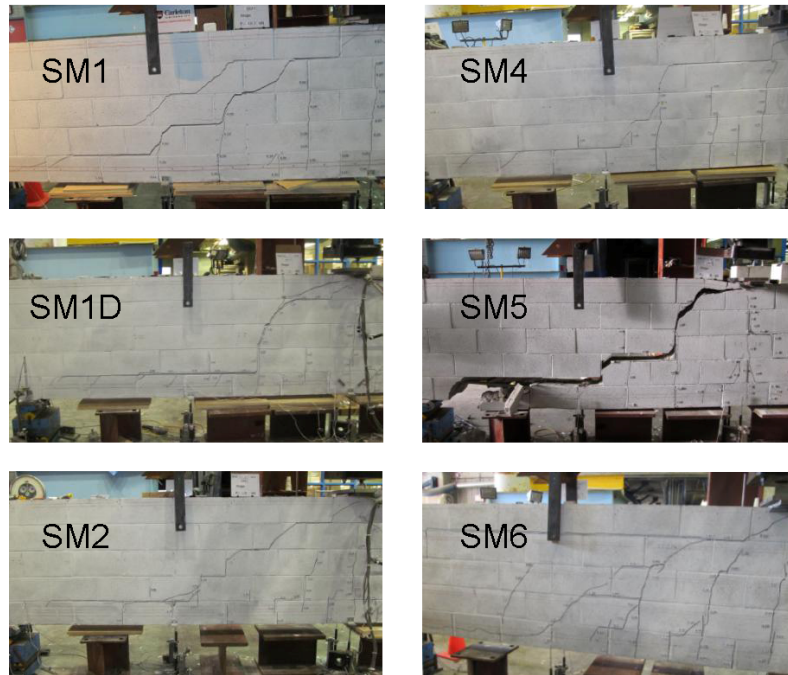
Failure Patterns of the Specimens (for the First Failure Sides)
